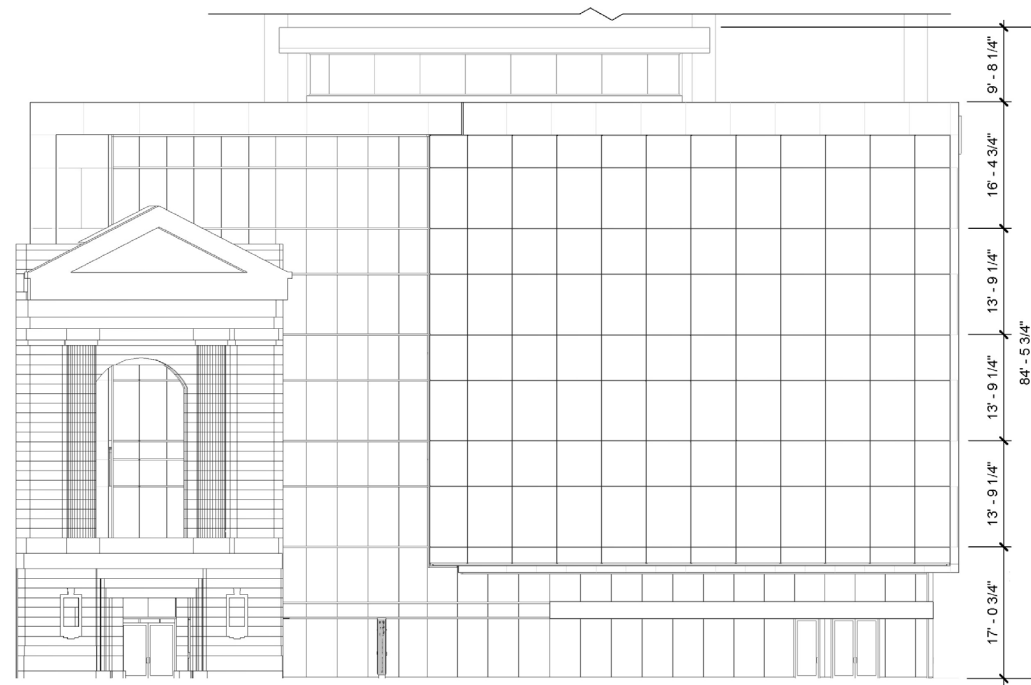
CentrepoinTE south elevation without the ALT Hotel tower.
